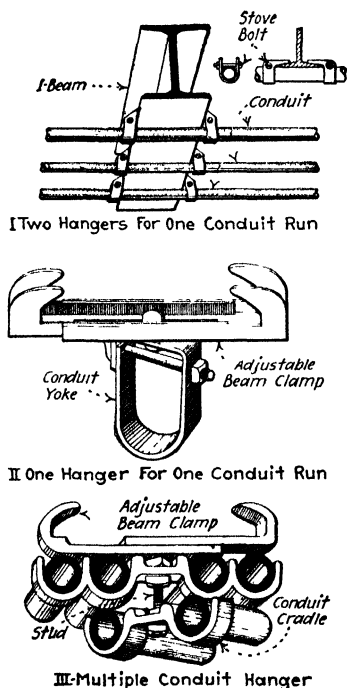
Conduit hangers for clamping conduit to I-beams.
